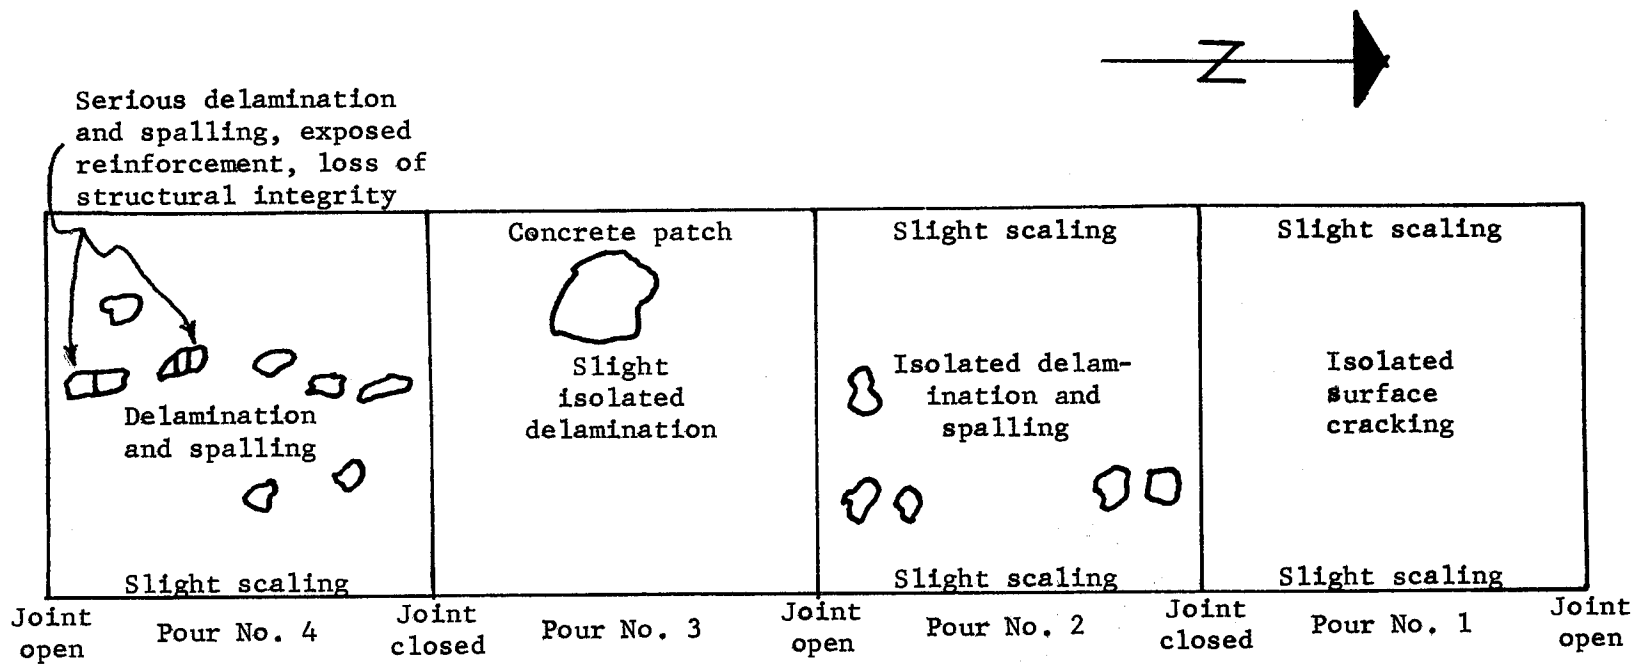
Plan View of Deer Creek Bridge Deck Showing Deterioration.
